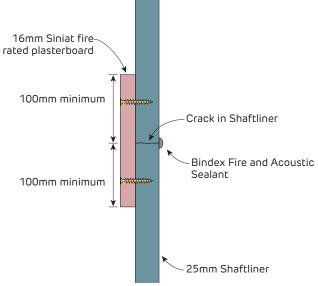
Fire Rated Patch for Shaftliner panel Section - FRL -/60/60
